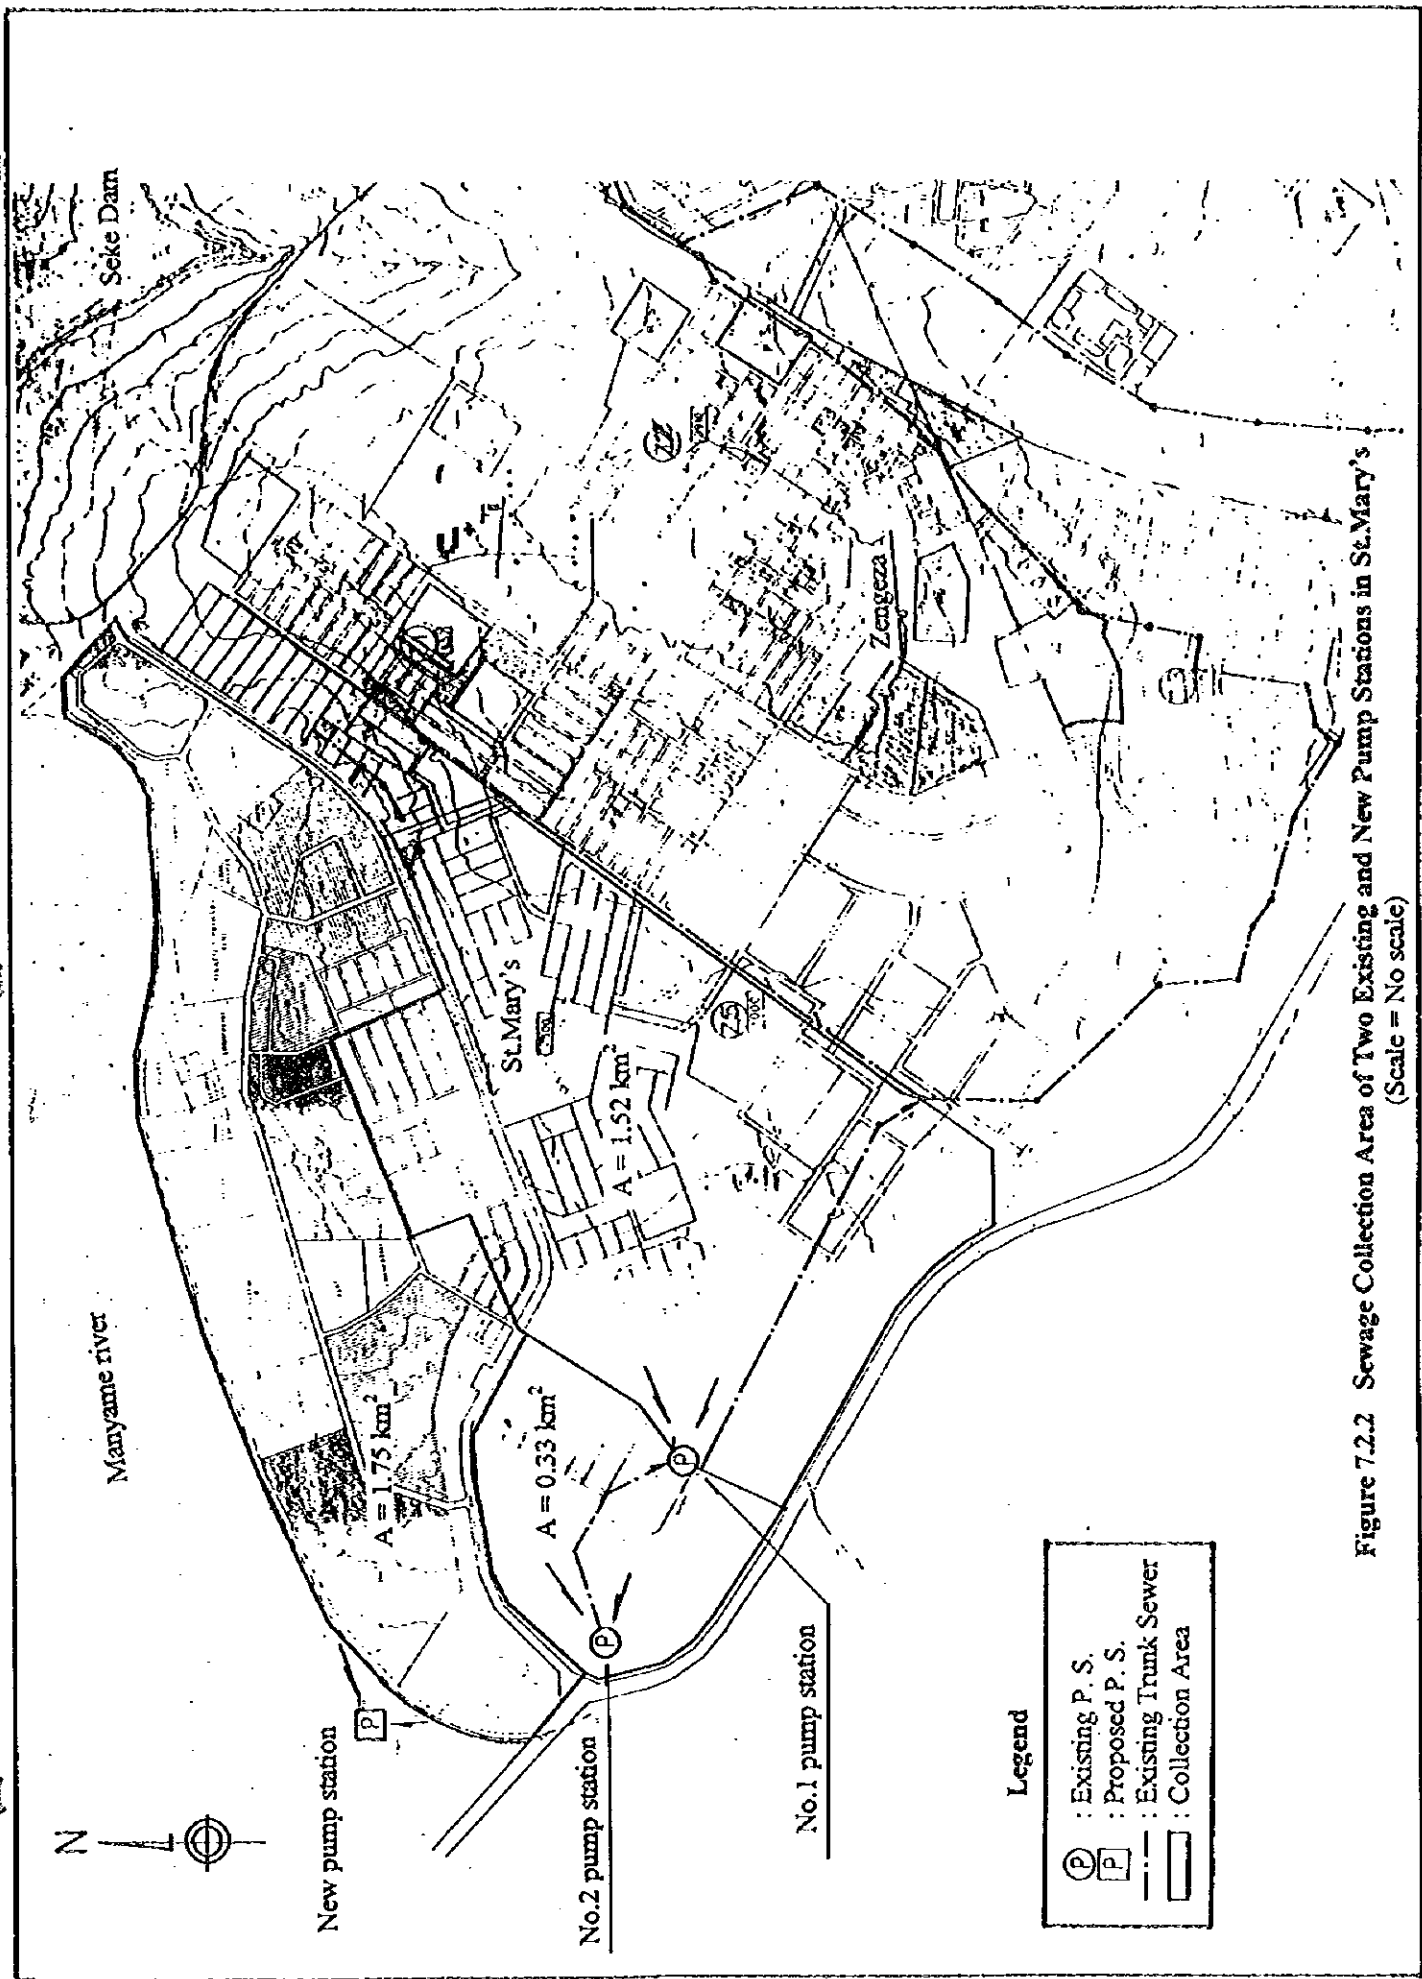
Sewage Collection Area of Two Existing and New Pump Stations in St. Mary's
